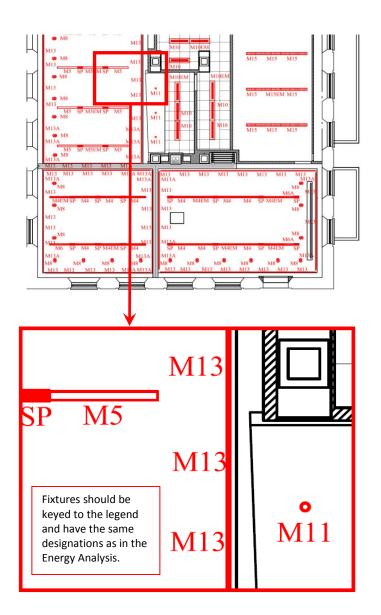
Lighting/Power – Reflected Ceiling Plan
